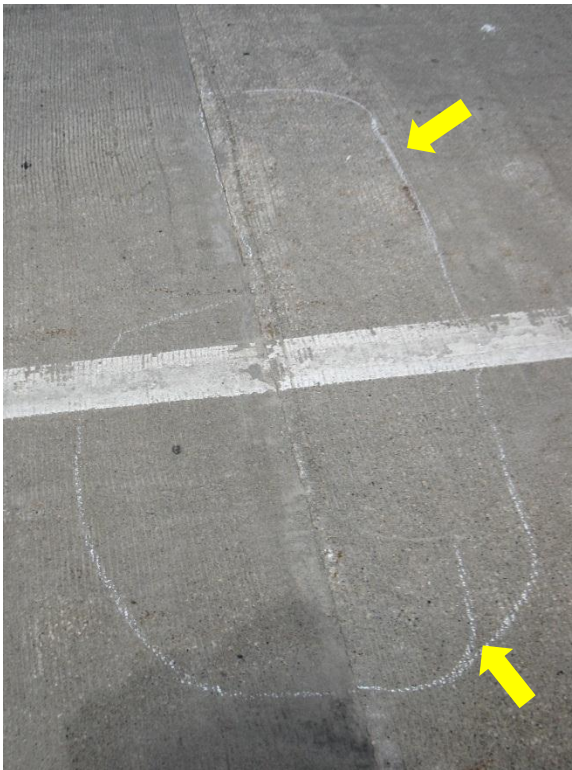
Delamination (highlighted with chalk) of concrete at a construction joint in overlay.
